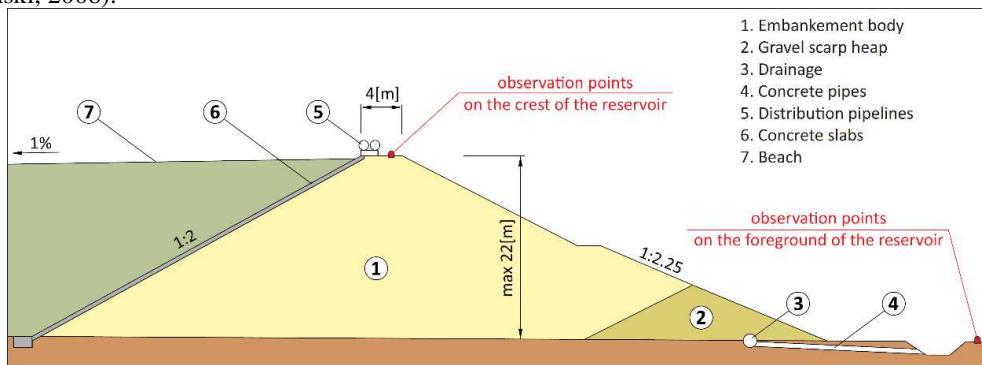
The cross-sectional structure of dyke (adapted from Piestrzyński, 2008)
